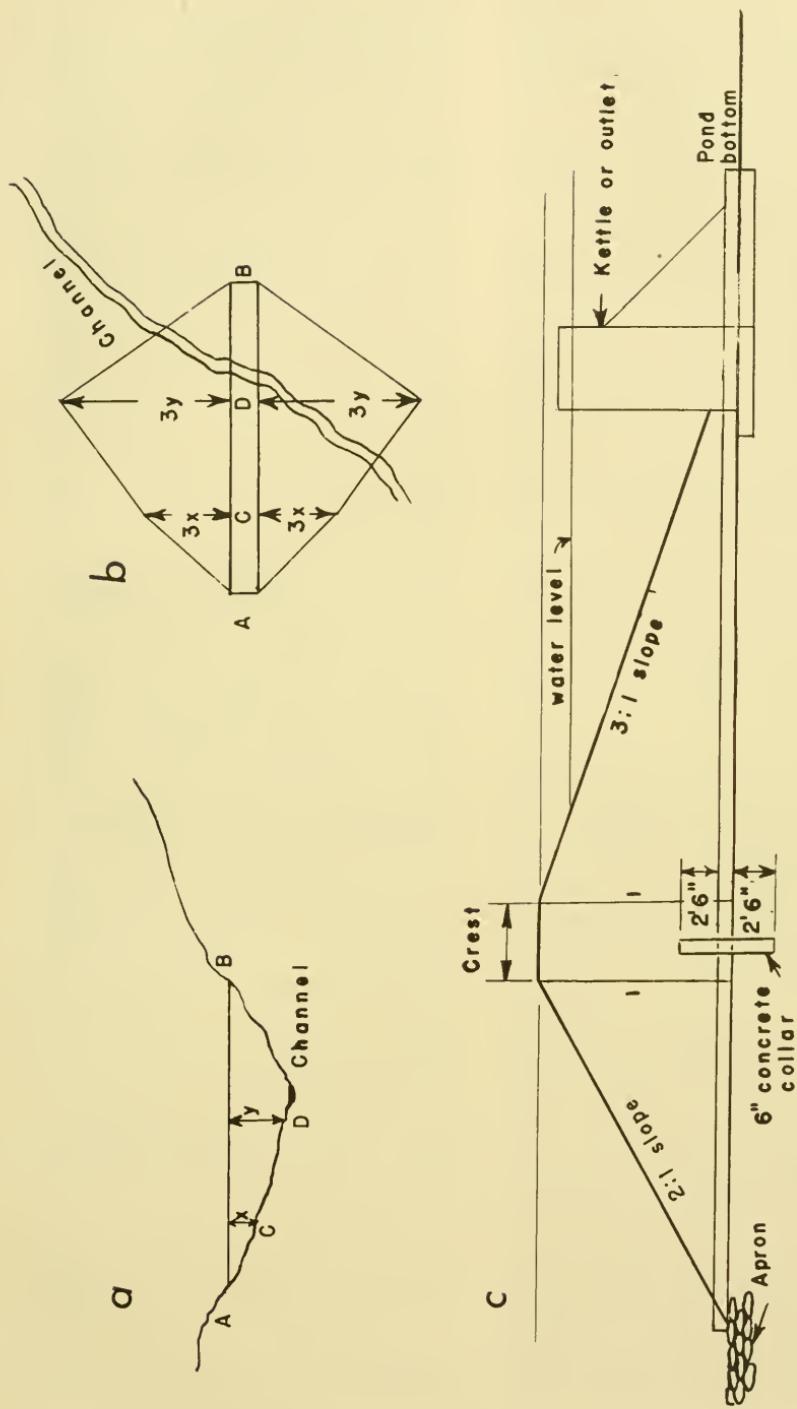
Details of dam construction showing outlet structures. a. Channel to be dammed.
